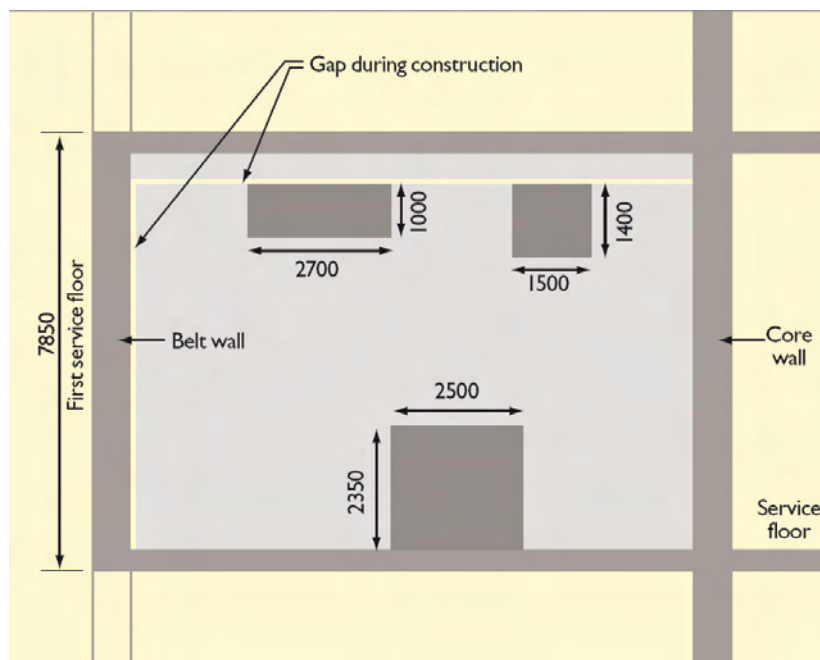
Elevation of a typical outrigger wall with service openings – gaps in the wall adjacent to slab and belt wall were provided to disengage outrigger during construction to minimise differential shortening effects (dimensions in mm)
